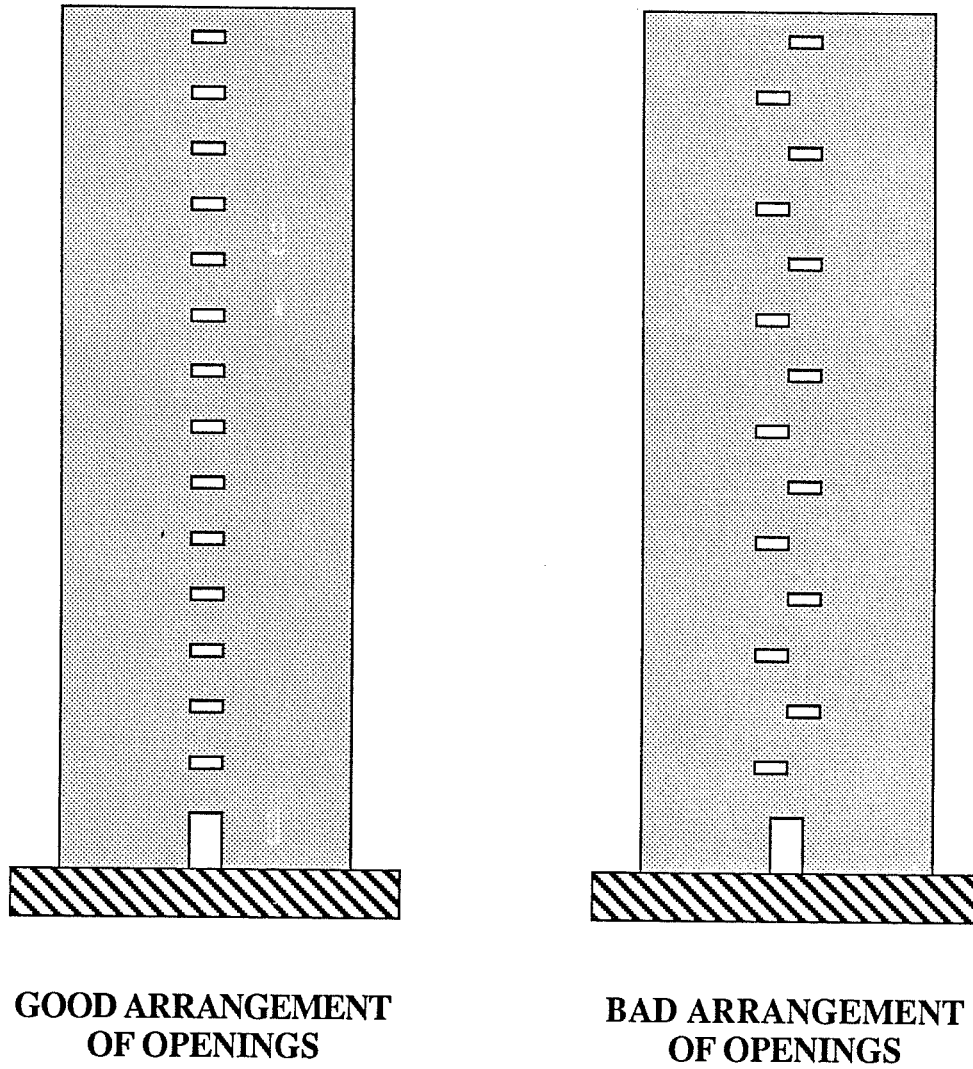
Positioning of Openings in a Shear Wall Building
